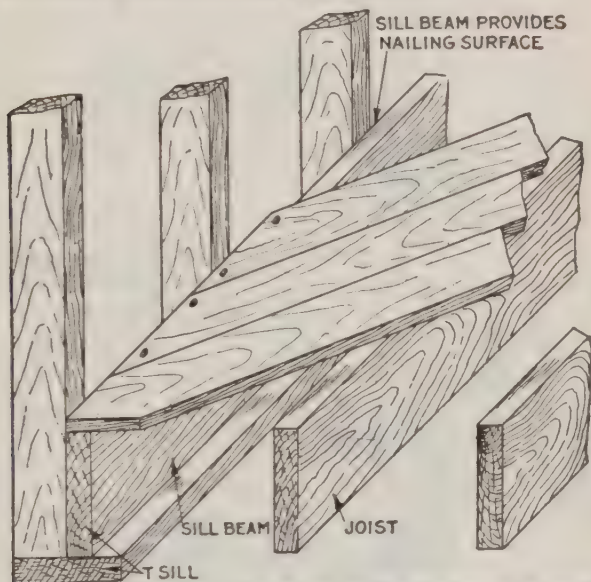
,834.—One of several types of built up sill which do not require an end joist to provide floor nailing surface.
